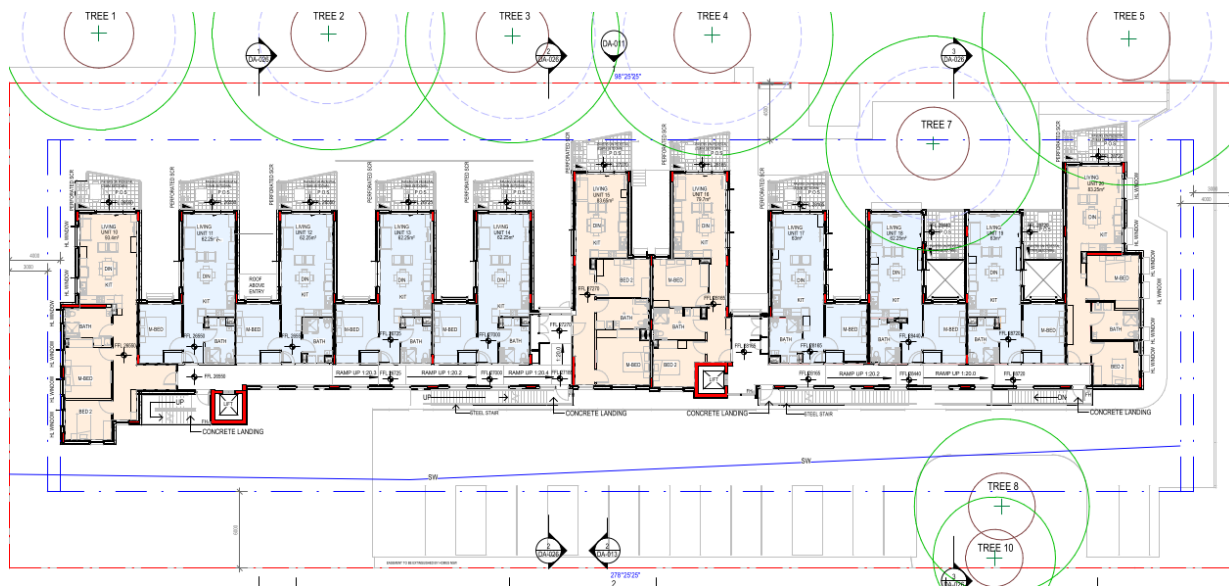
Extract from Architectural Plans – First Level (Source: Architectural Plans, Custance Architects, dated 16/09/2024)
